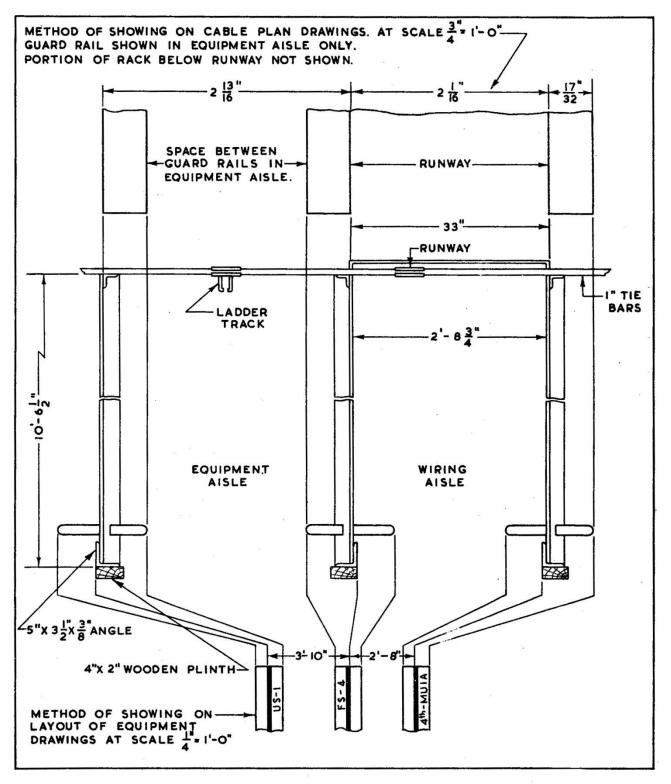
2000 TYPE EQUIPMENT, METHOD OF SHOWING RACKS ON LAYOUT OF EQUIPMENT AND CABLE PLAN DRAWINGS.
